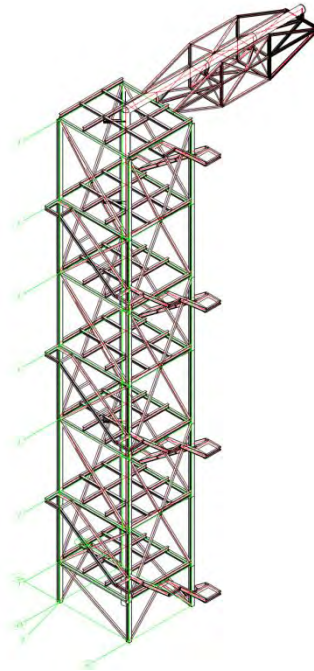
Axonometric view of the furnace tower of study, designed in Autocad 2011 (Autodesk).
